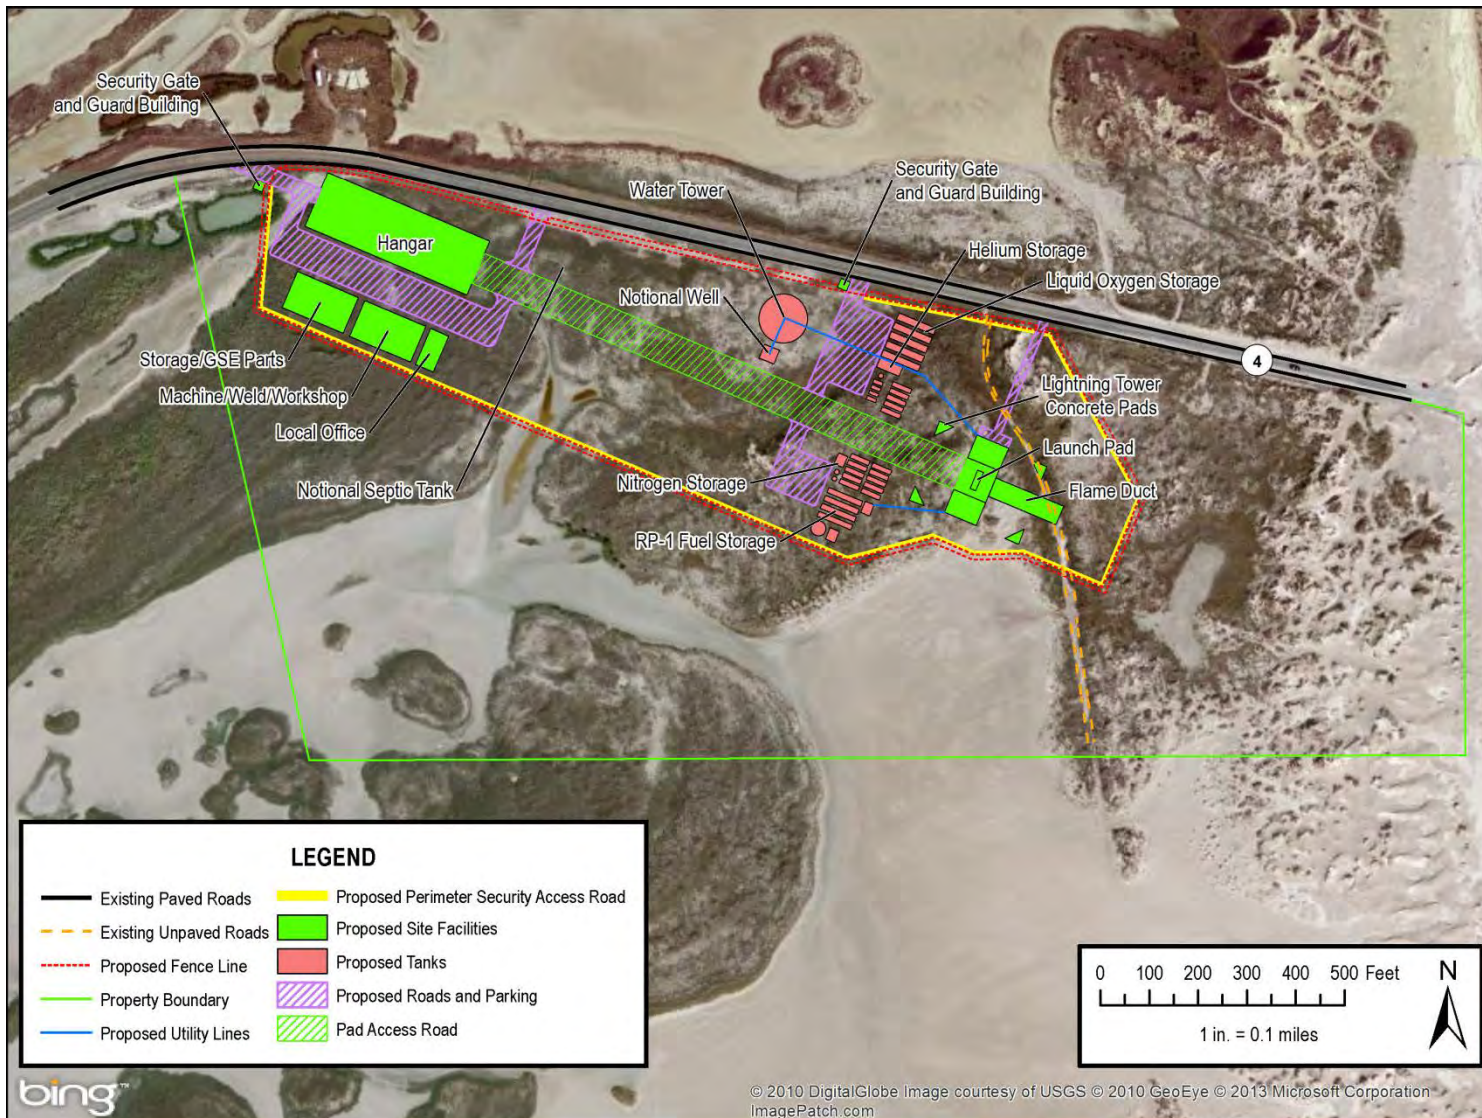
Proposed Vertical Launch Area Site Layout
